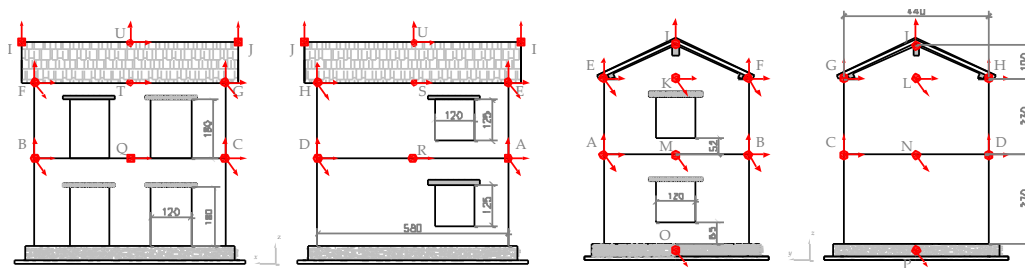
Front views of the walls of the reference geometry and position of the accelerometers installed for the shake table testing (red dots and arrows indicating the monitored dofs).
